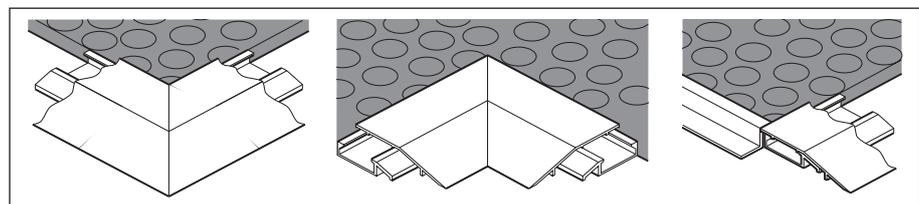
Cut lower sections of the ramp rails on the corners of the Safety Mat system to size
